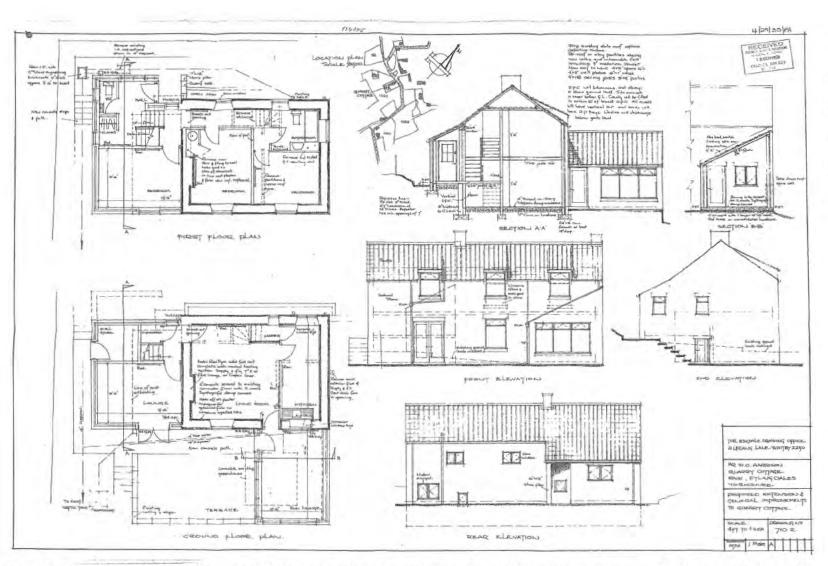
Application 40290035. Scheme approved in 1975 showing substantial extensions to the south west and south east elevations along with alterations to the roof including installation of dormer windows. The chimney stack to the north east elevation is to be removed and the kitchen window enlarged. (An existing drawing was not in the file.)
